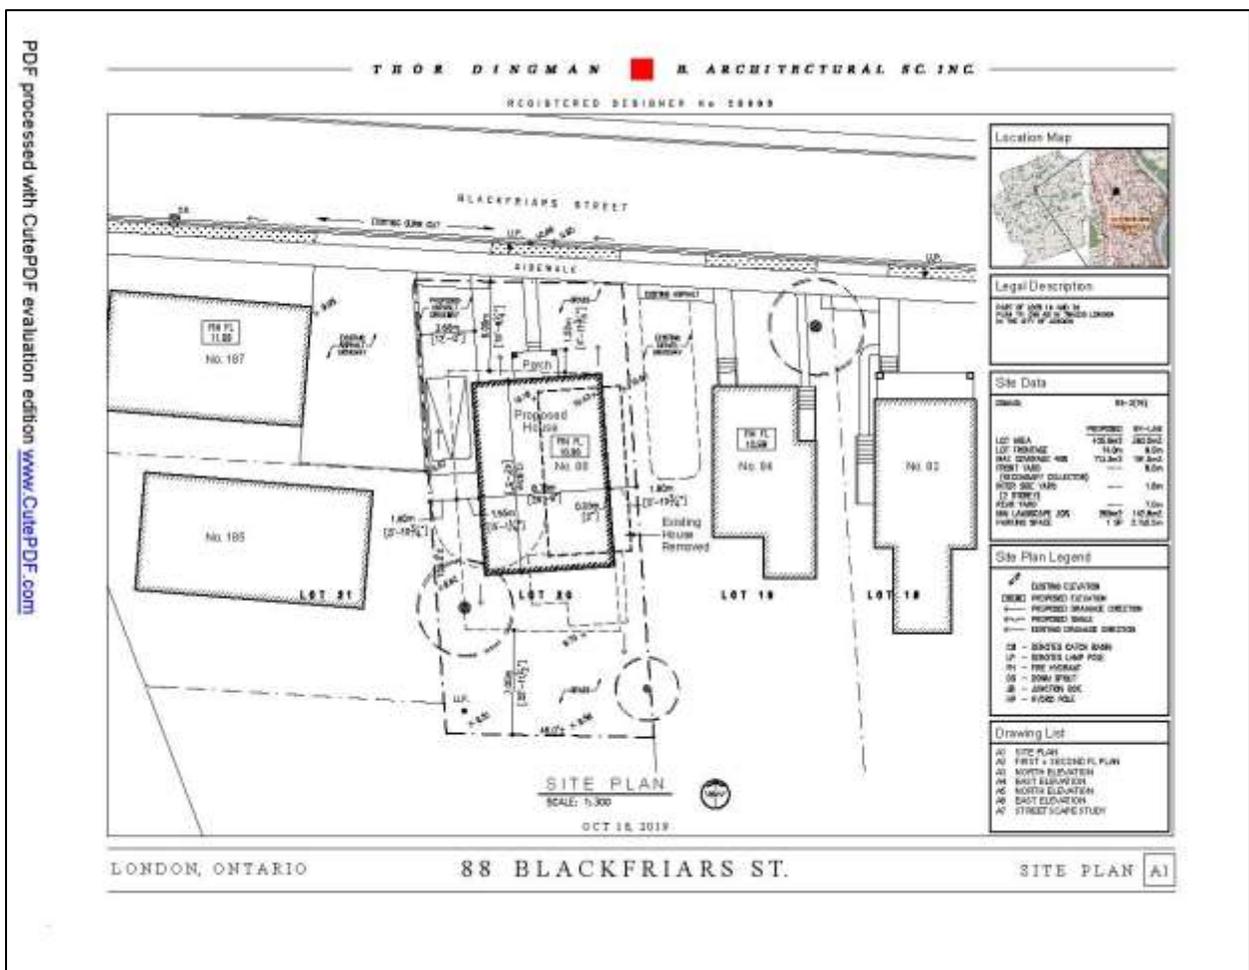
Site plan showing the proposed new building at 88 Blackfriars Street with the setbacks and footprints of adjacent and nearby buildings in the Blackfriars/Petersville Heritage Conservation District.
